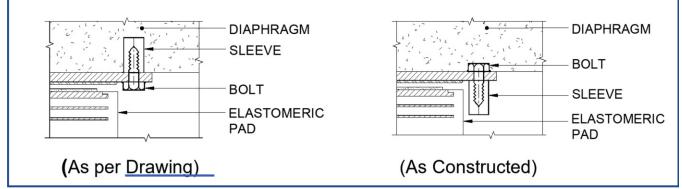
Fixing of the Bolt for Top Plate of Bearing
